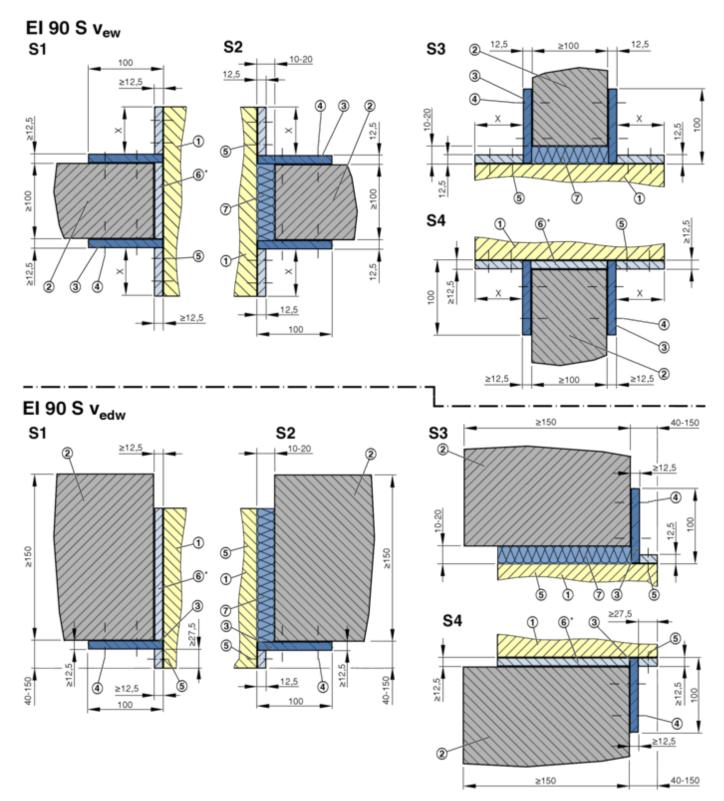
Details EK-JZ dry mortarless installation in solid wall, solid shaft wall EI 90 S
